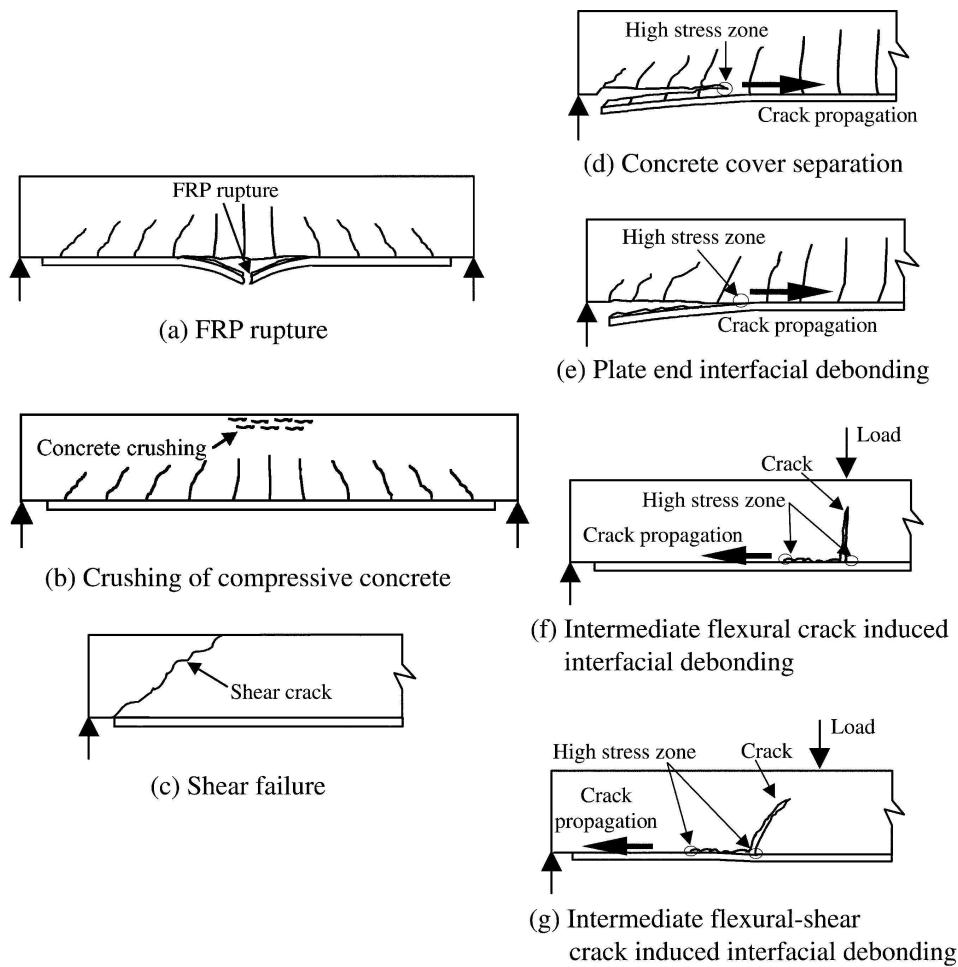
Failure modes of RC beams flexurally-strengthened with an FRP soffit plate (from Teng et al., [58]).
